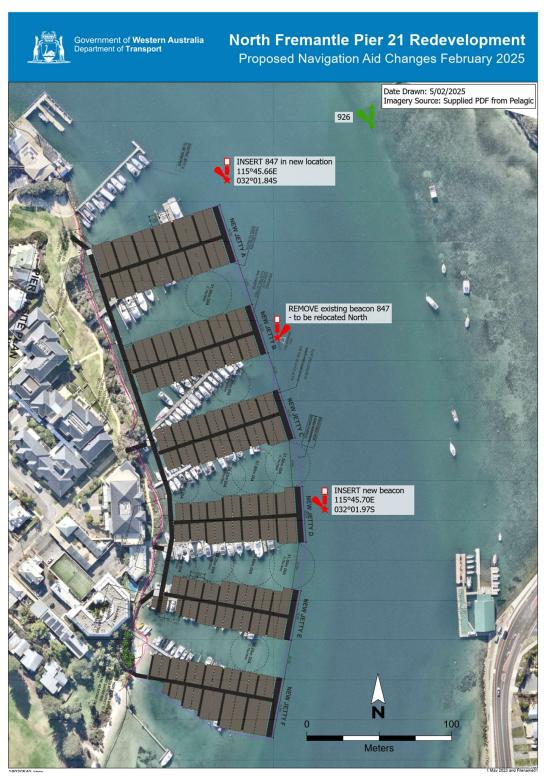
Proposed new marina layout and Nav Aid locations (Source: DoT)
